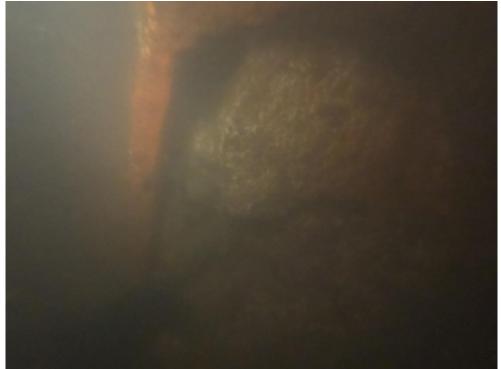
Hole at MLWS, Outpan No. 149 – Full loss of pan face – Typical detail along South face
